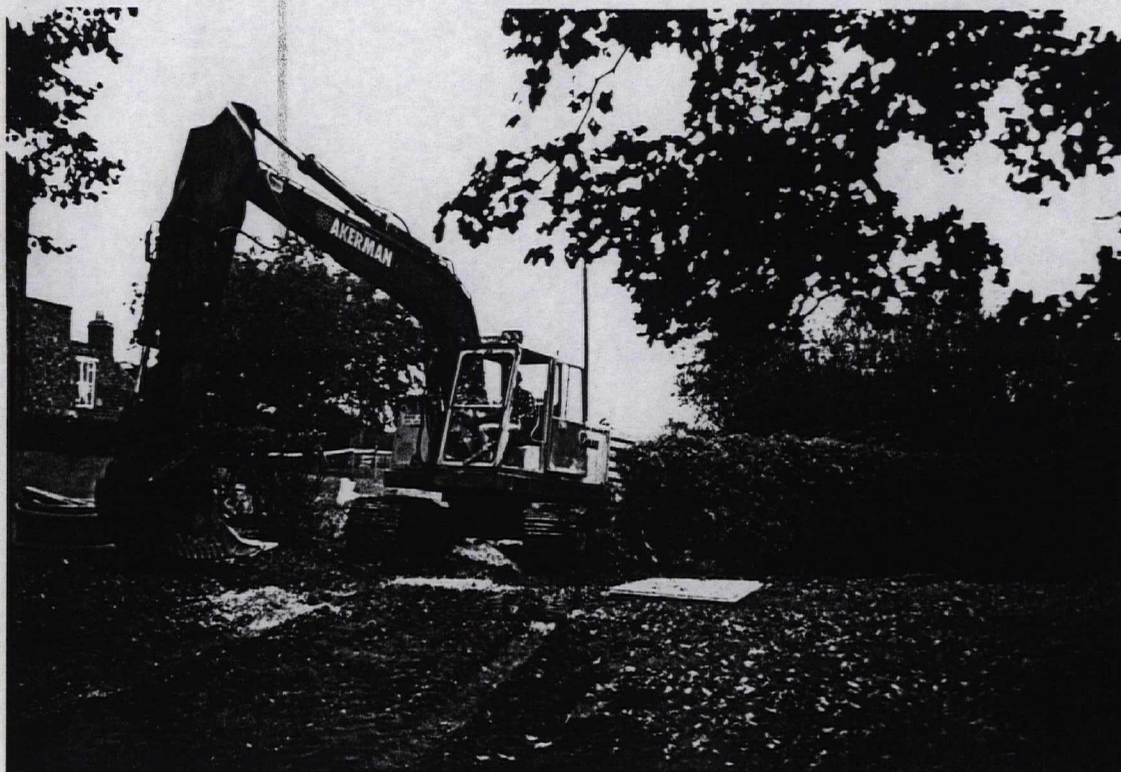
SCHOOL GROUNDS LOOKING NORTH
